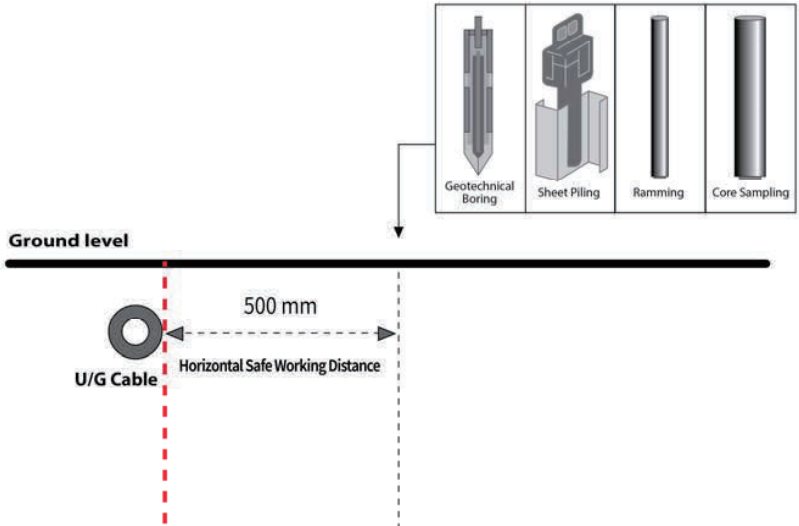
Minimum safe working distance of vertical, horizontal or inclined penetration works
